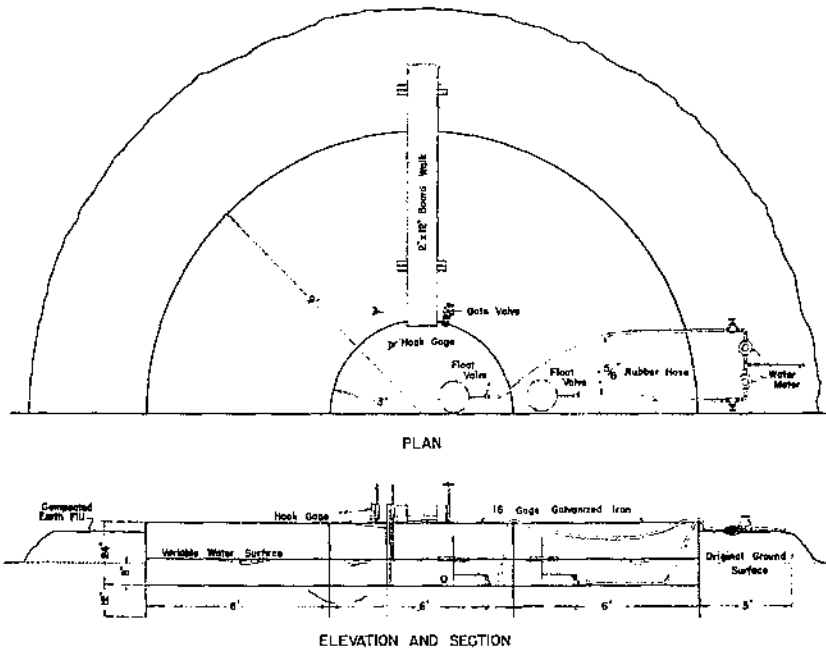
Plan, elevation, and section of seepage rings used in five representative soils.
